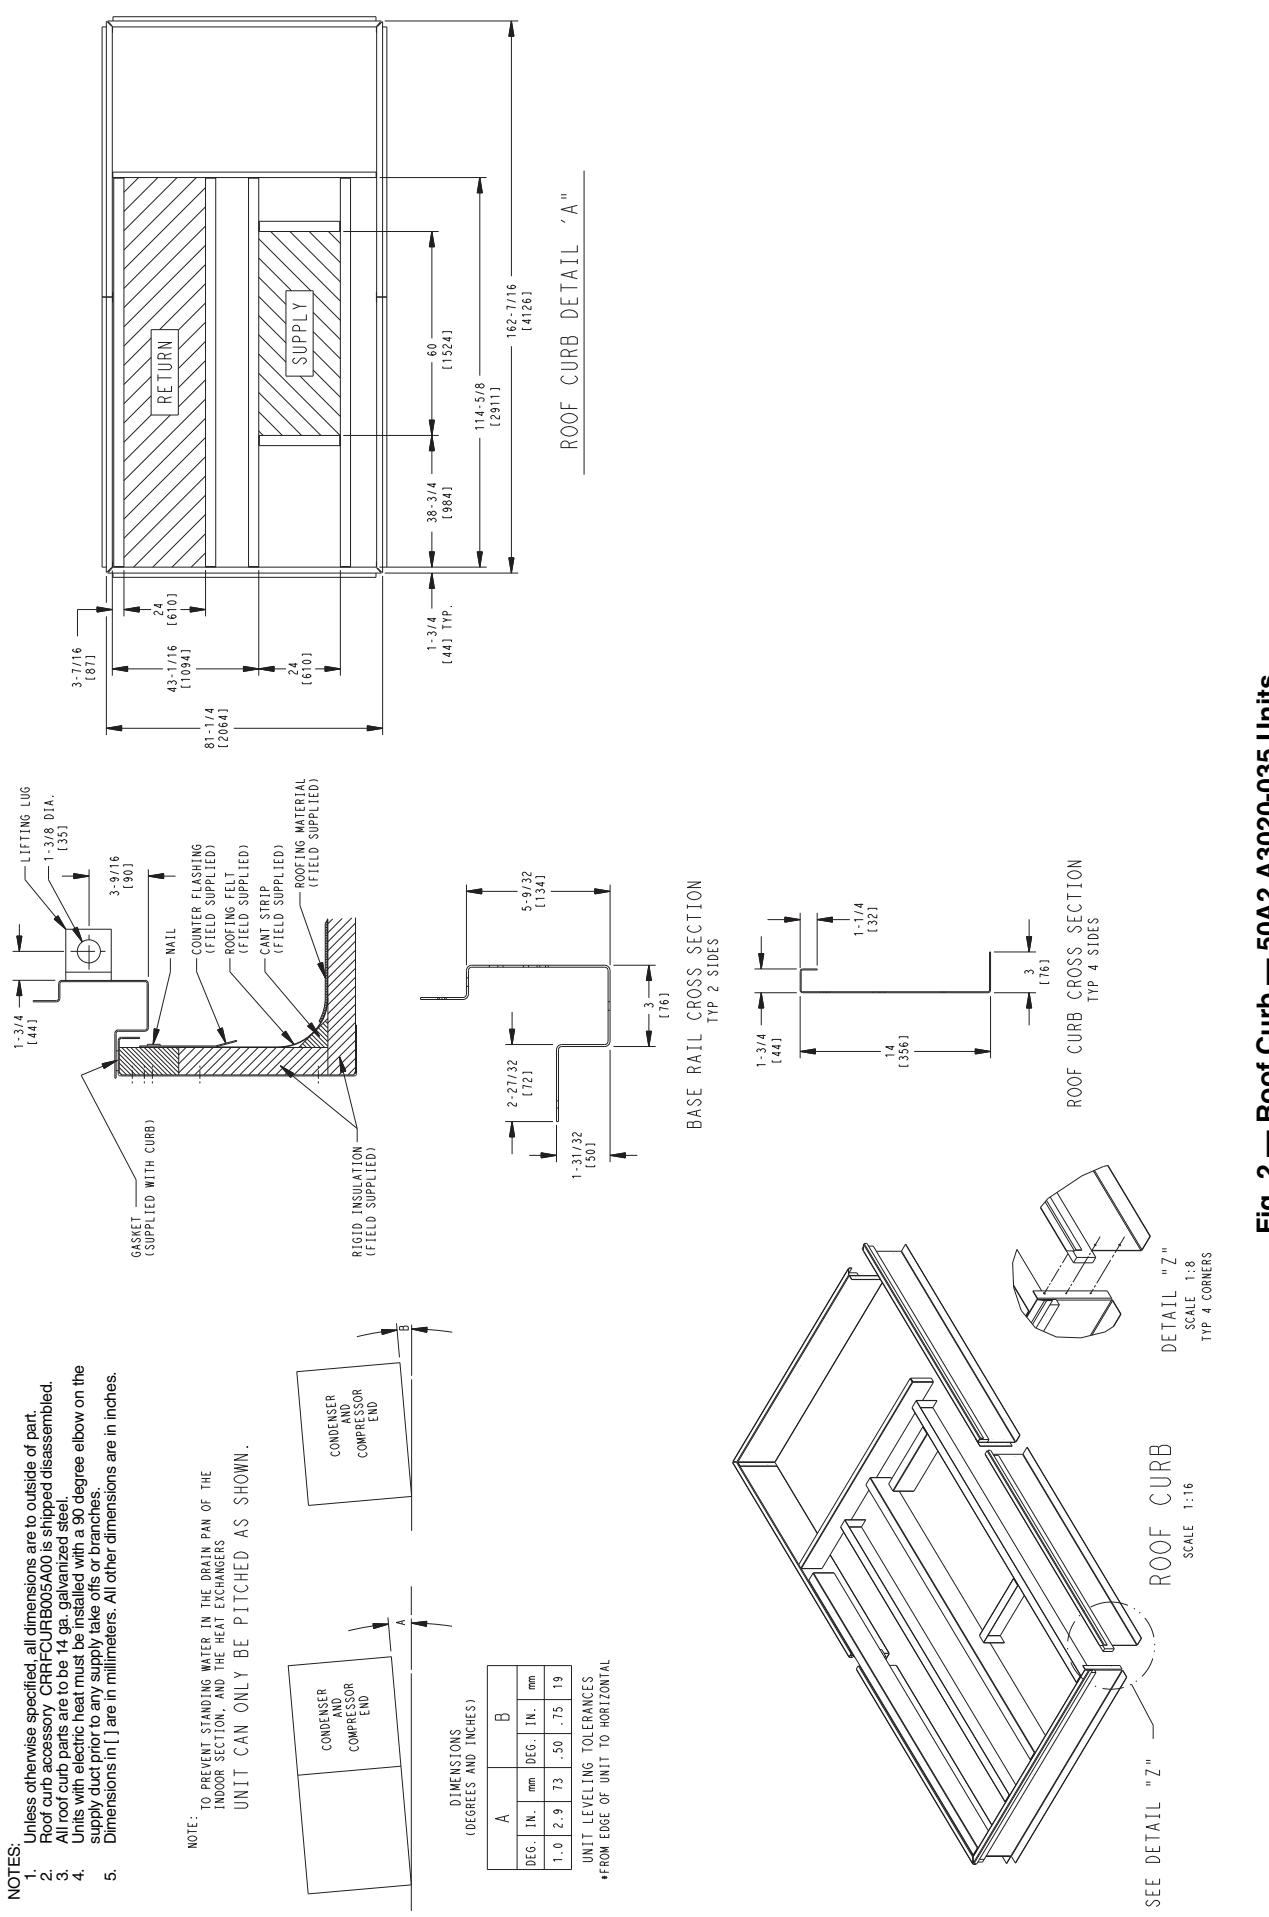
Roof Curb — 50A2,A3020-035 Units
